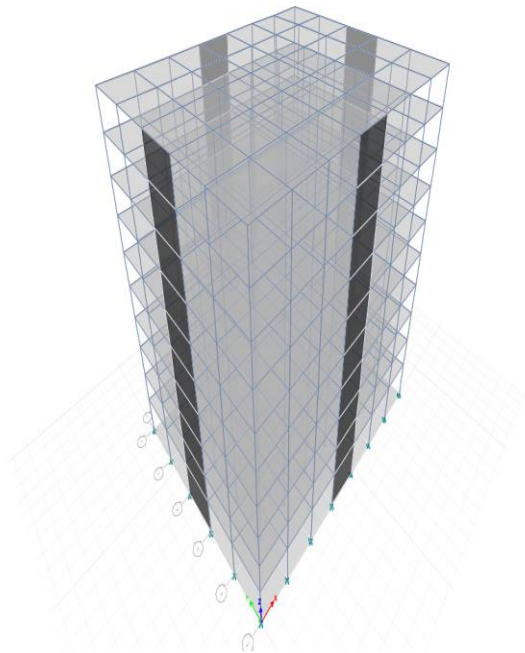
3D view of dual RC frame structure with side center shear wall.
